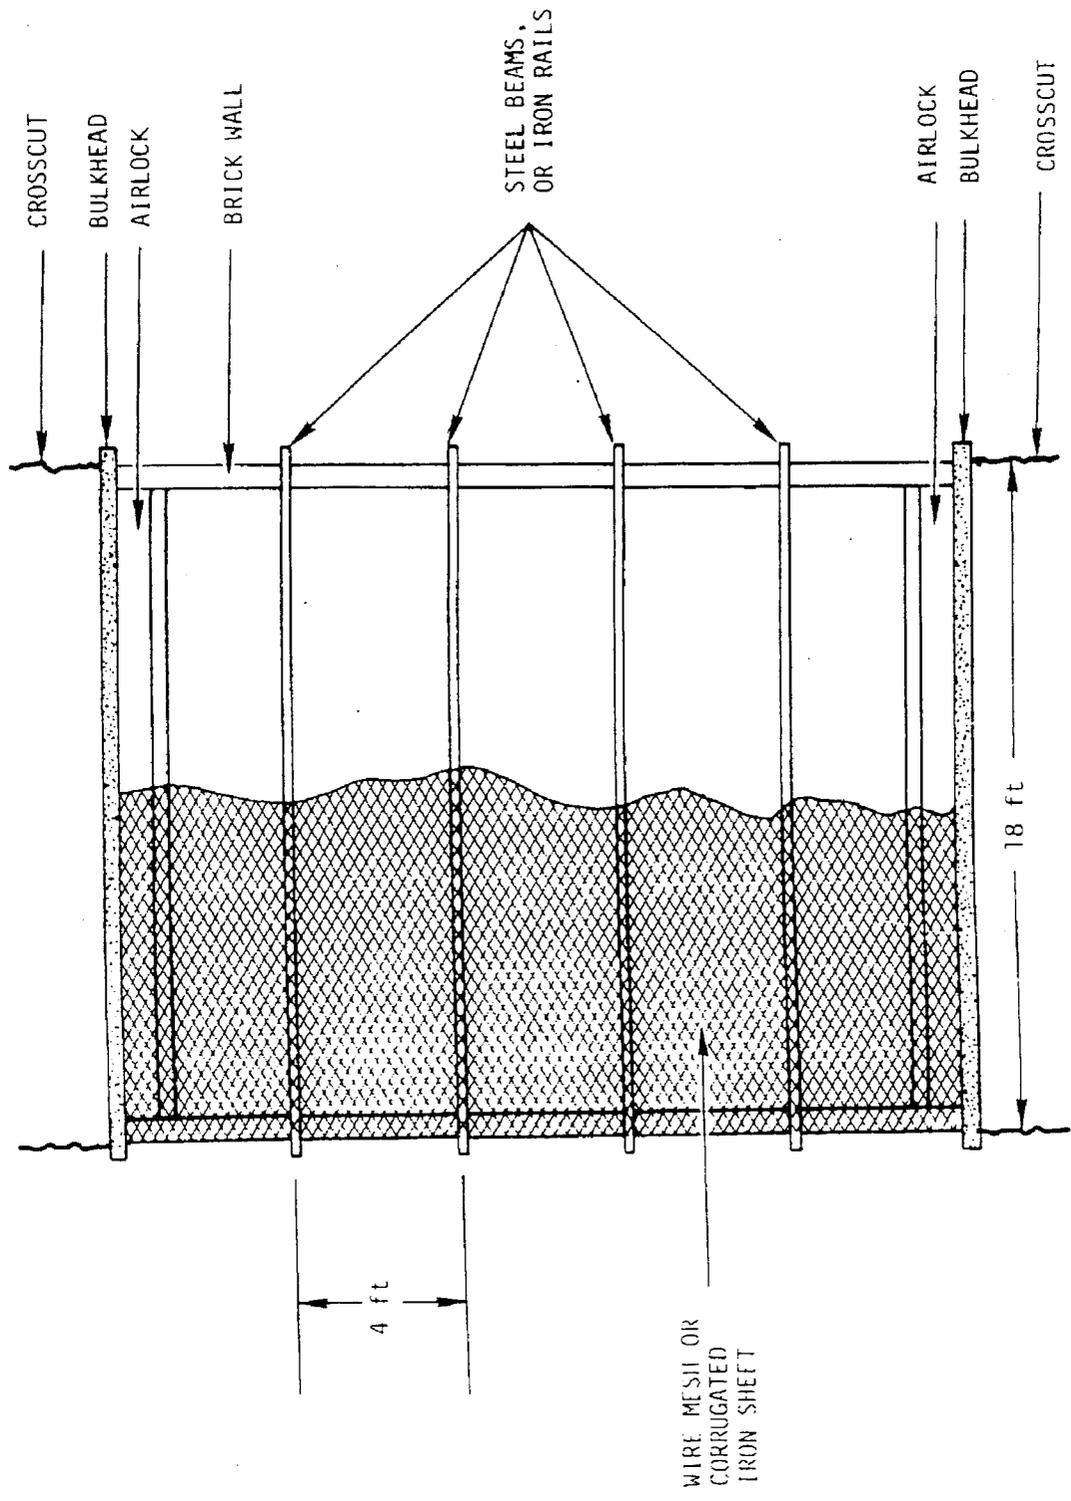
Support plan for rescue chamber using steel beams or rails with wire mesh or corrugated iron sheet.
